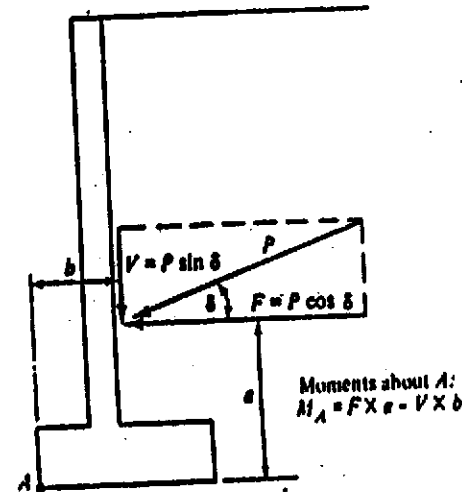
Reduction of overturning moment by wall friction on a retaining wall.
